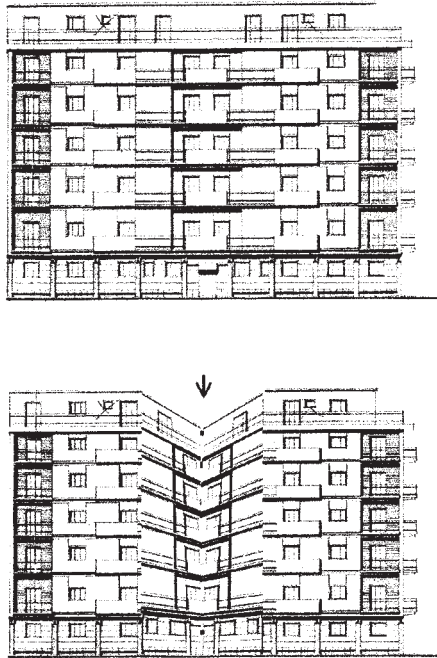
The pancaking collapse as the building fell on itself floor upon floor starting from the center, where the stairways were located.
